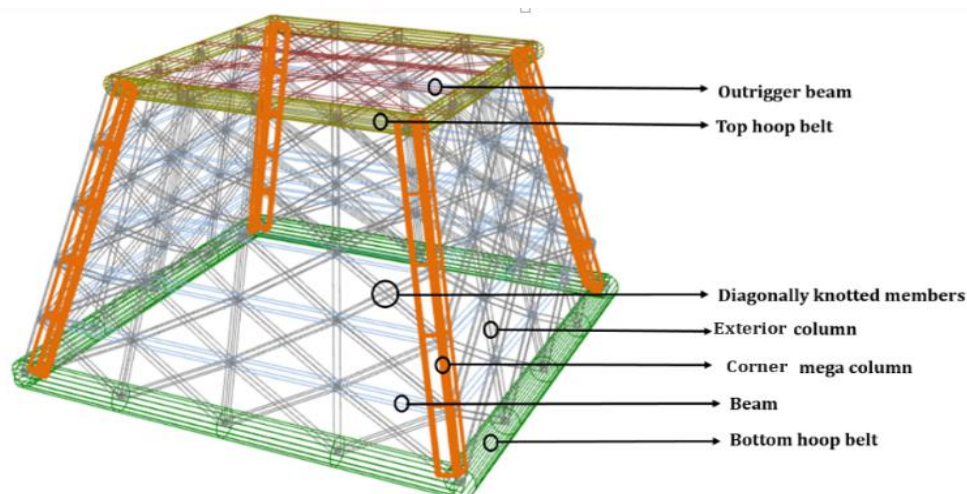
Trapezoidal prism shaped building showing components of DOKO structural system
